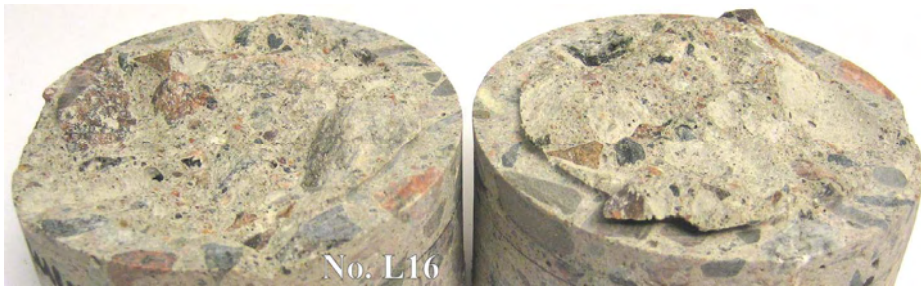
Photograph showing the failure surface for test No. L16 after fatigue test.
